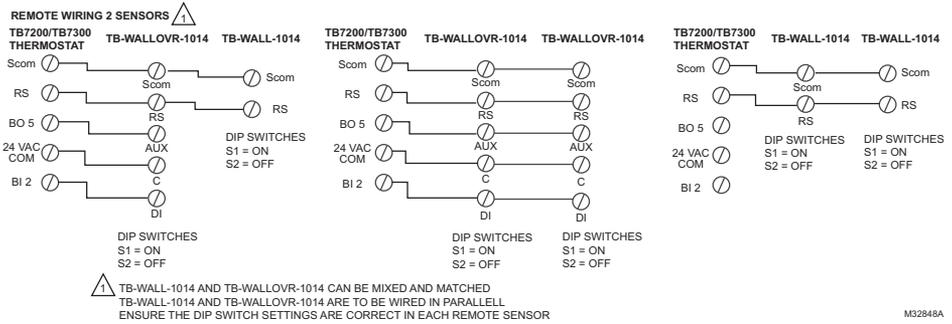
Wiring examples of two remote wall mounted room sensors for averaging applications
